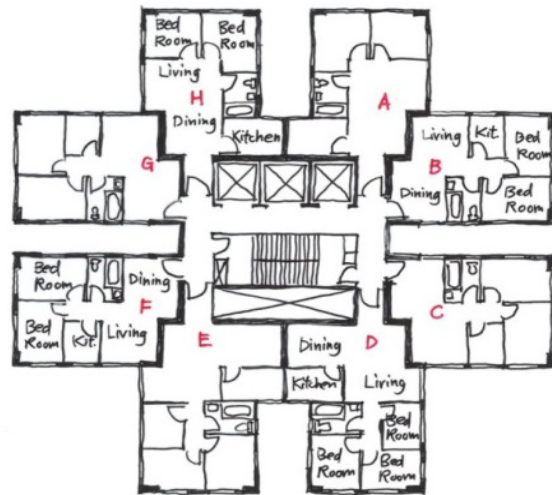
Typical floor plan of richland gardens²⁷, another PSPS residential development completed in 1985.
